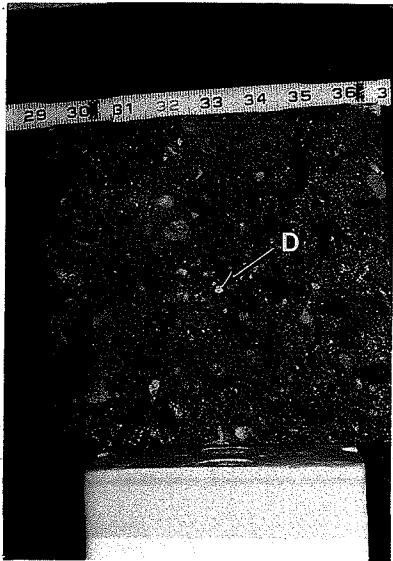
View of underside of concrete piece from top surface of parking garage floor slab
